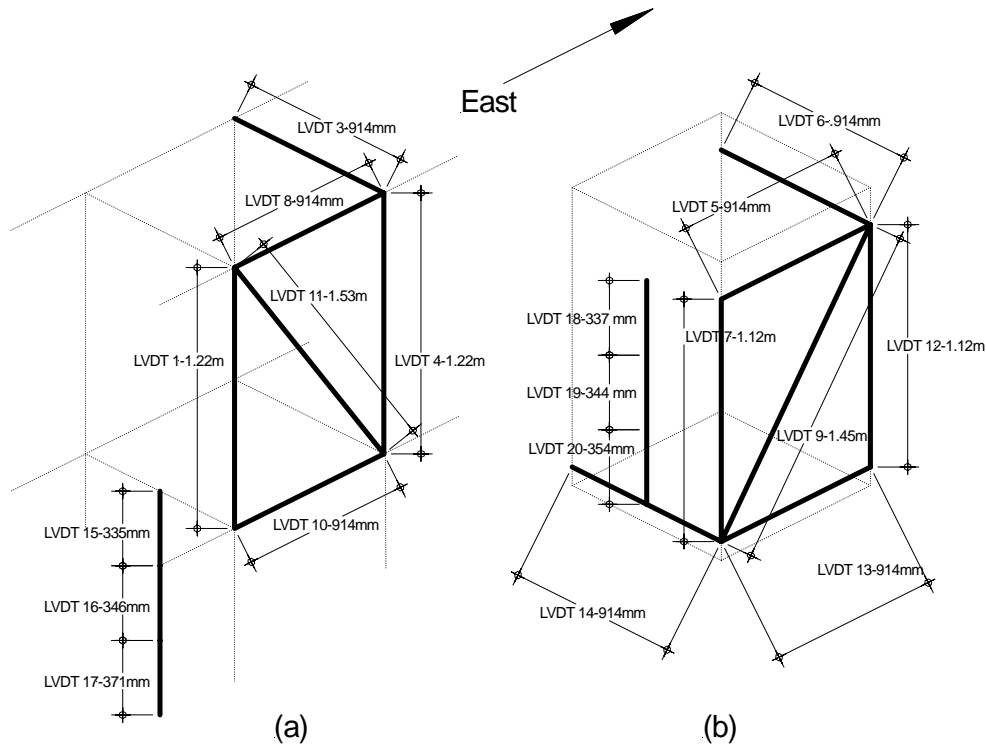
LVDT array: (a) South face of center column, cap-beam joint, (b) South face at the base of center column
